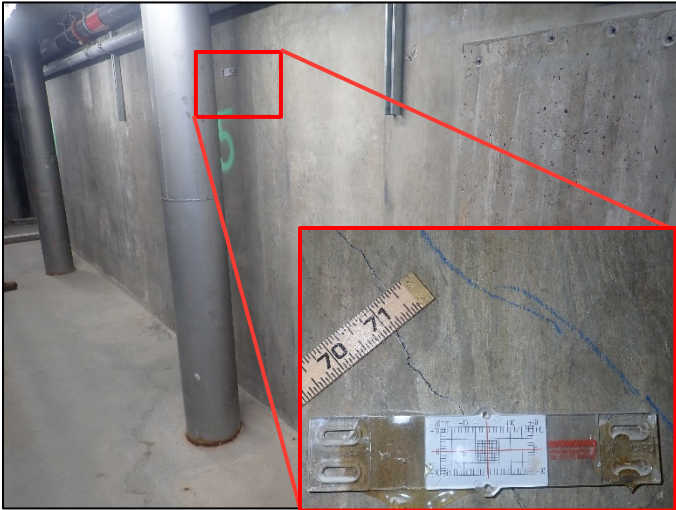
1/16" wide crack in north wall between plenum space and control room with installed crack gauge, north (control room) side shown, looking southeast
